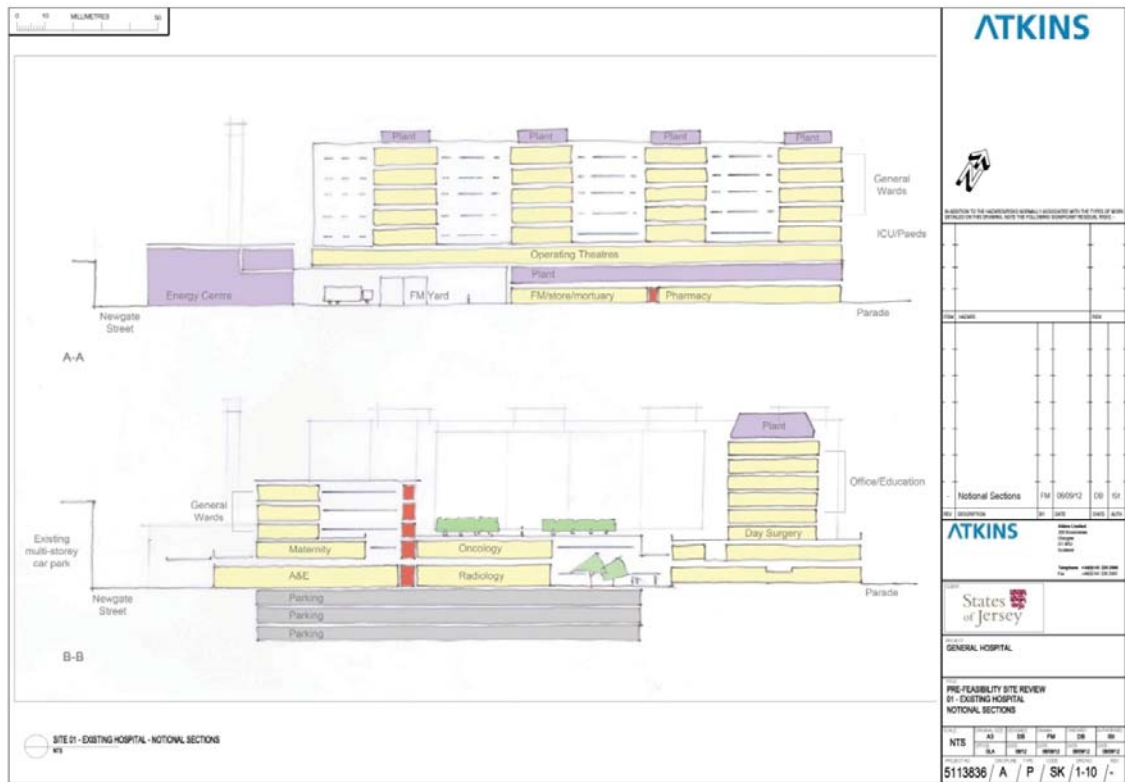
Site 1 -Existing General Hospital potential site development plan
